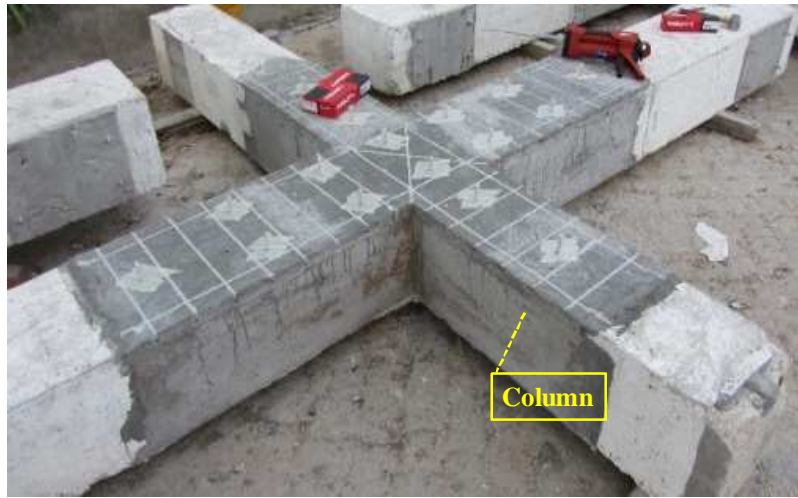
Details of the schemes used for the retrofitting of the damaged specimens (dimensions in mm)
